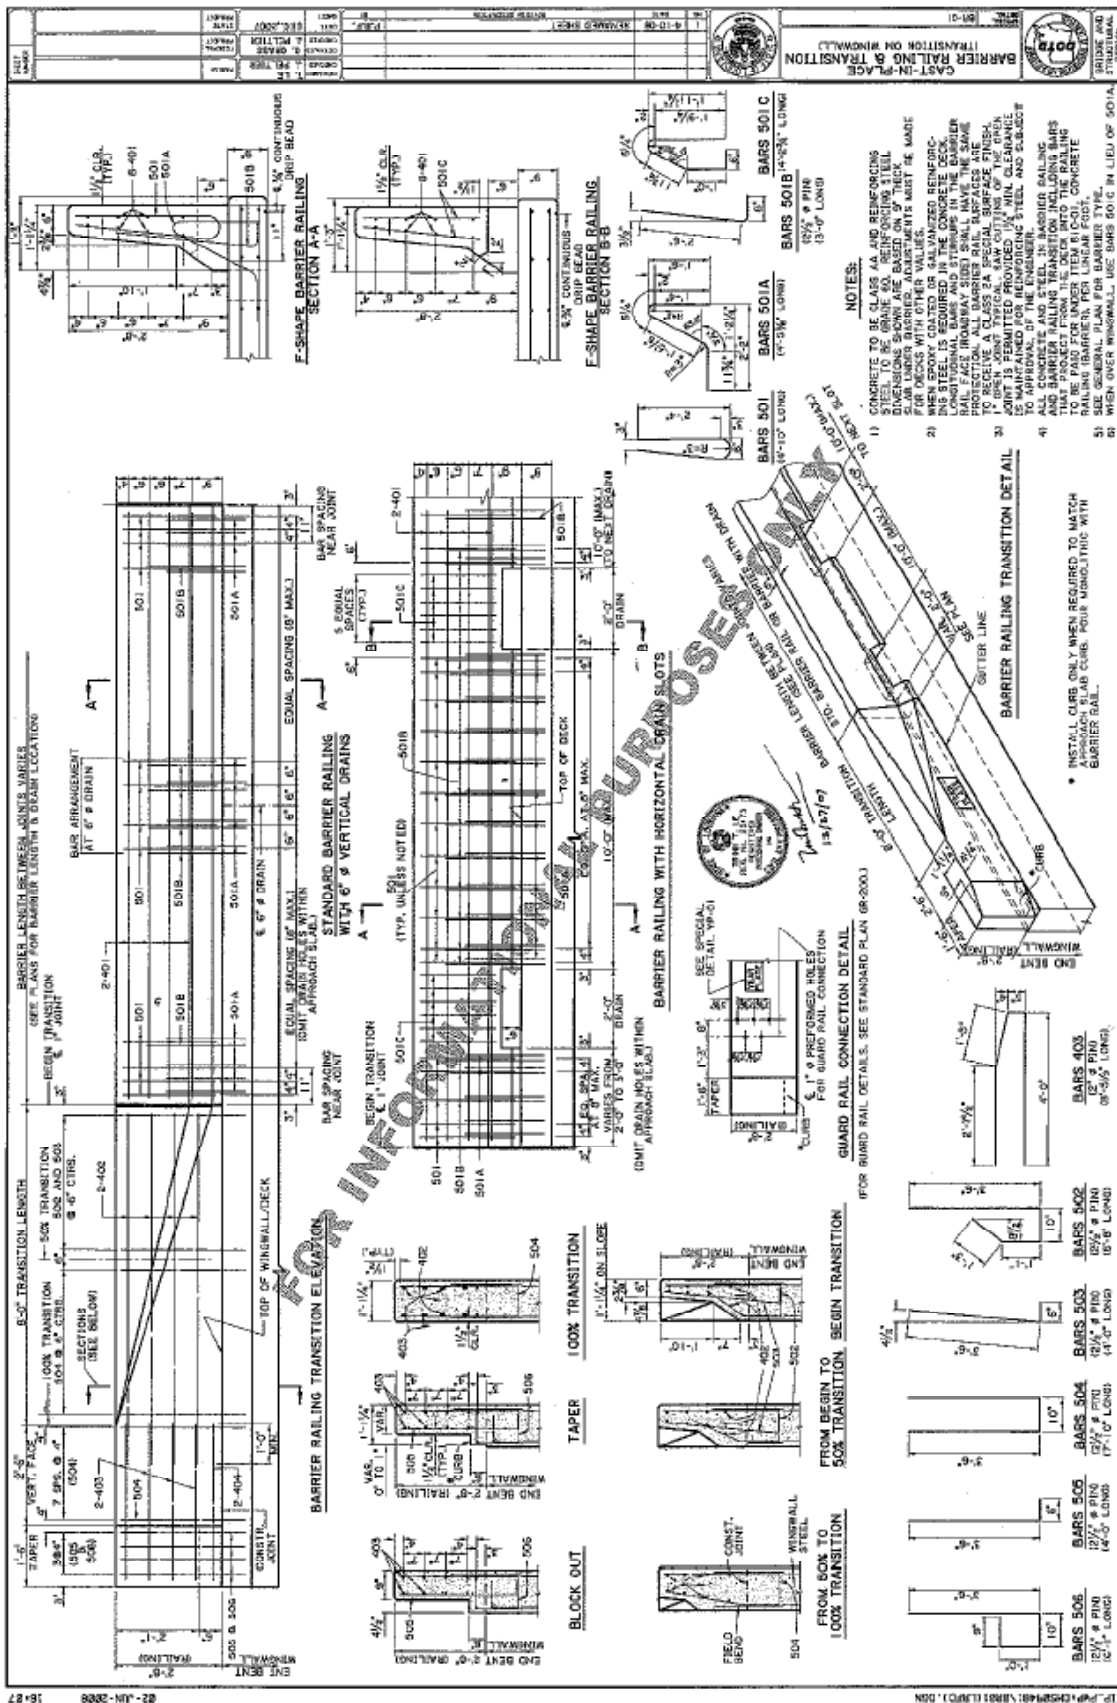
Details of F-Shape Concrete Barrier with Slotted Drain Holes.
